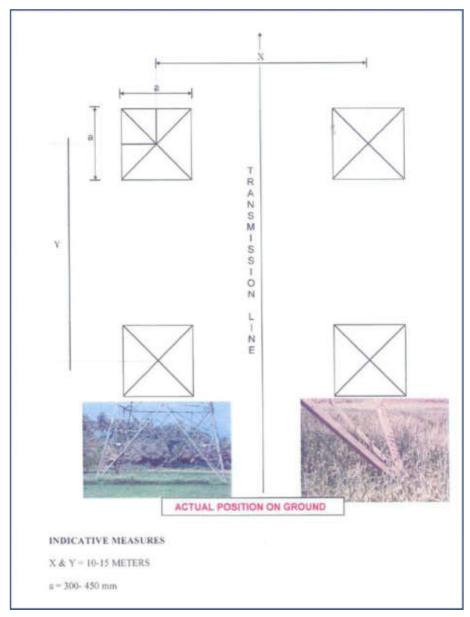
TYPICAL PLAN OF TRANSMISSION TOWER FOOTINGS
